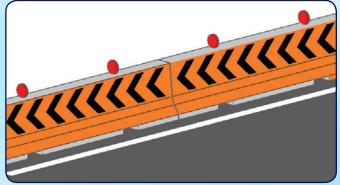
Example of precast concrete safety barrier to delineate deviations along the carriageway
